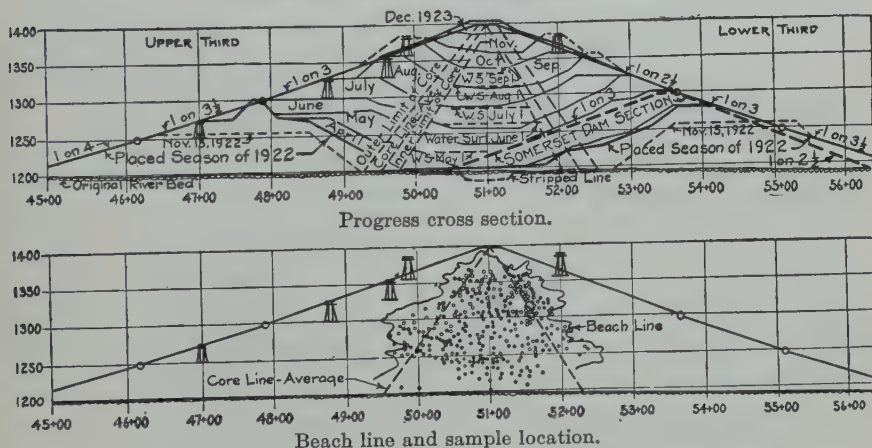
Davis Bridge dam, sections—New England Power Company.
